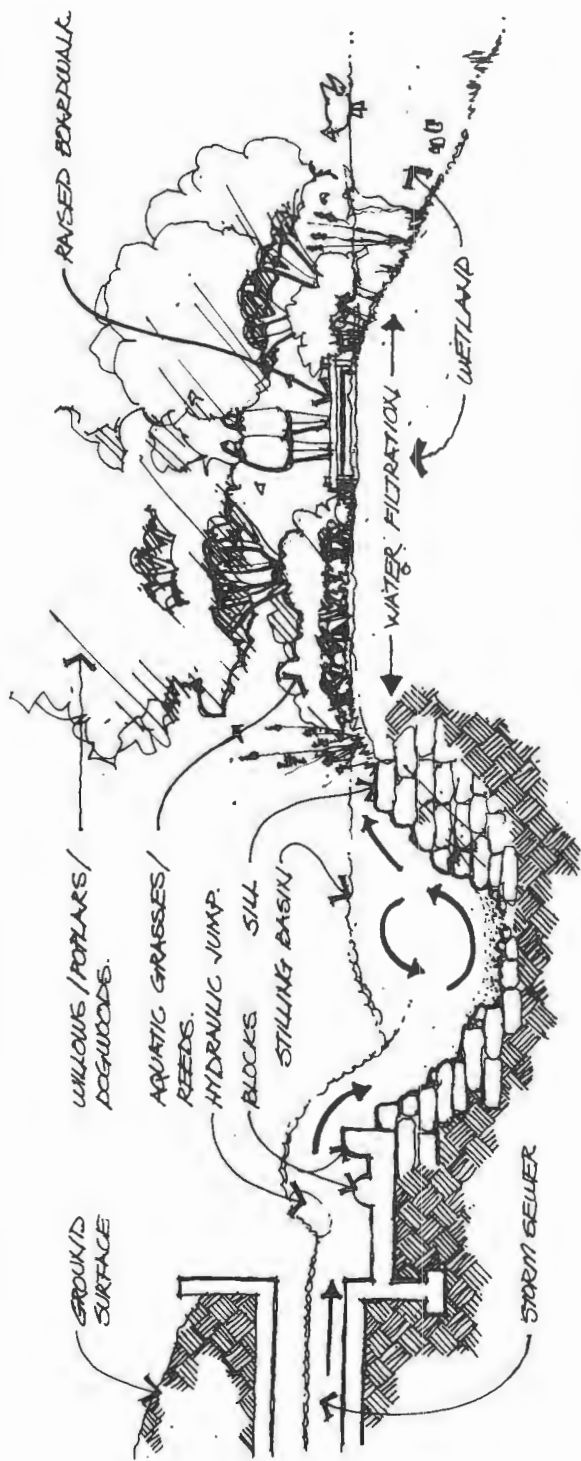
SECTION - SEWER OUTFALL POND/MARSH SYSTEM
